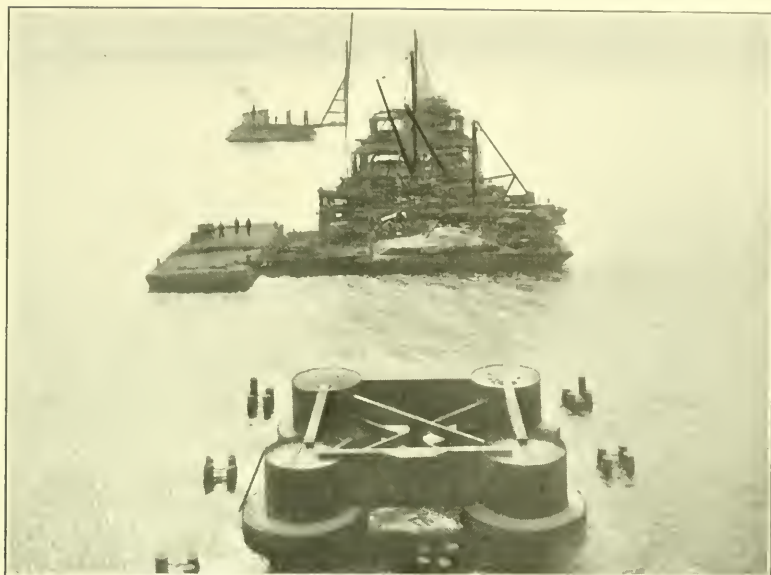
LOOKING WEST FROM ENGINE-HOUSE, ON DUMBARTON POINT DRAWSPAN.
